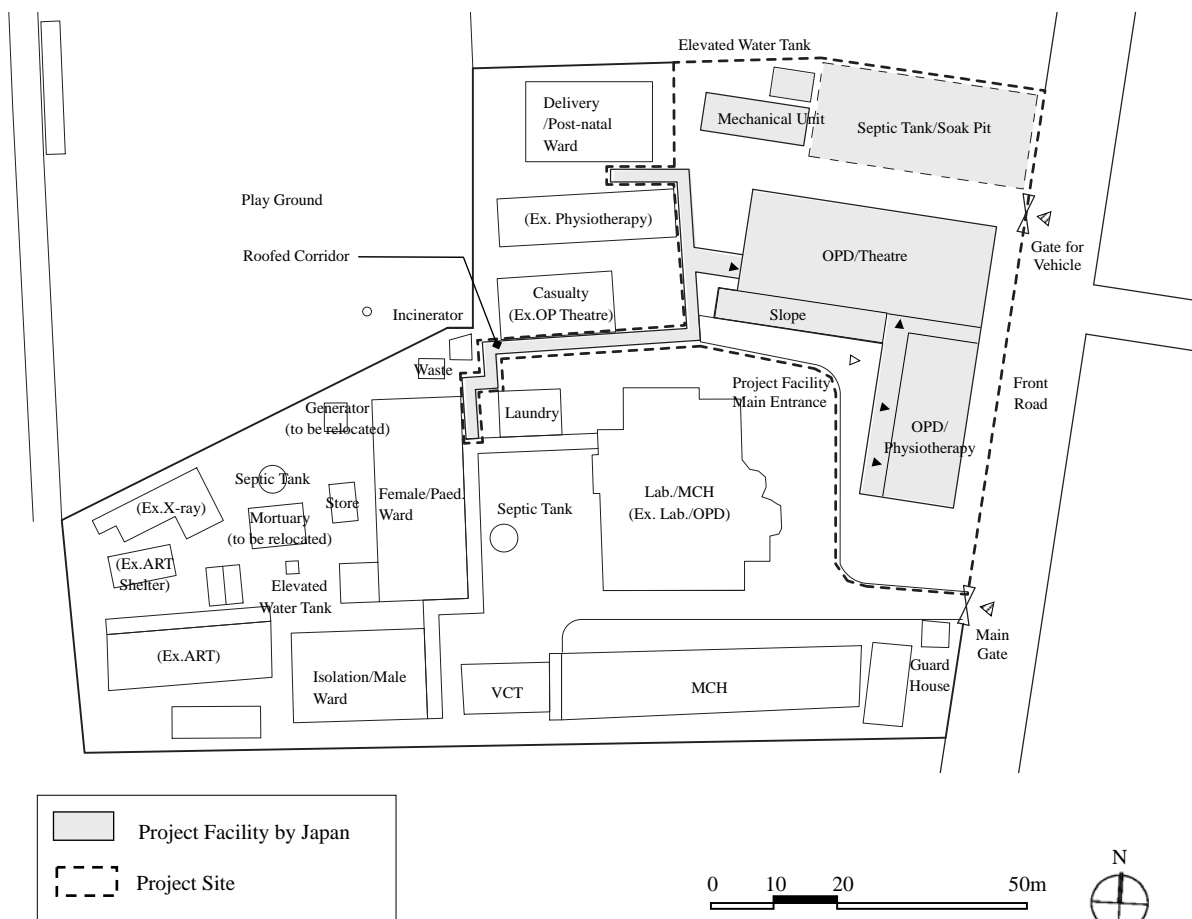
Existing Facilities and the Layout Plan of Chawama Lv1H Project Facilities
